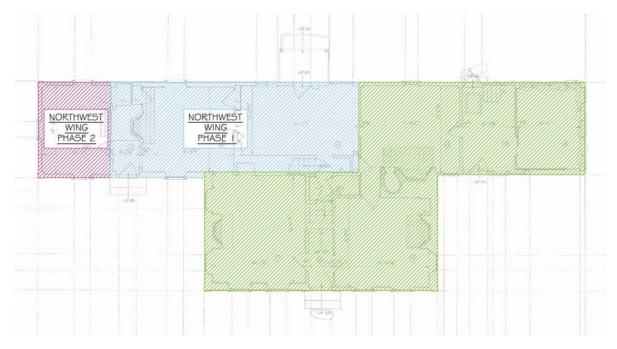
A-6. Northwest Wing Phases 1 & 2 conjectural plan, overlaid on HABS drawings (not to scale).
